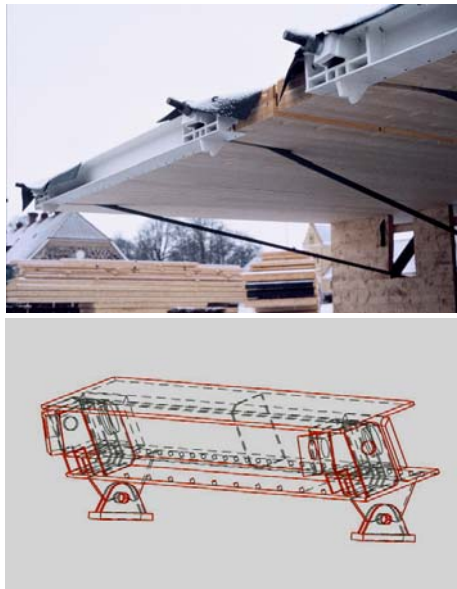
Lower end of a roof element with plate-rod connection during assembly on the ground (above). Drawing of the same joint with steel fittings for placing on top of the columns (below).
